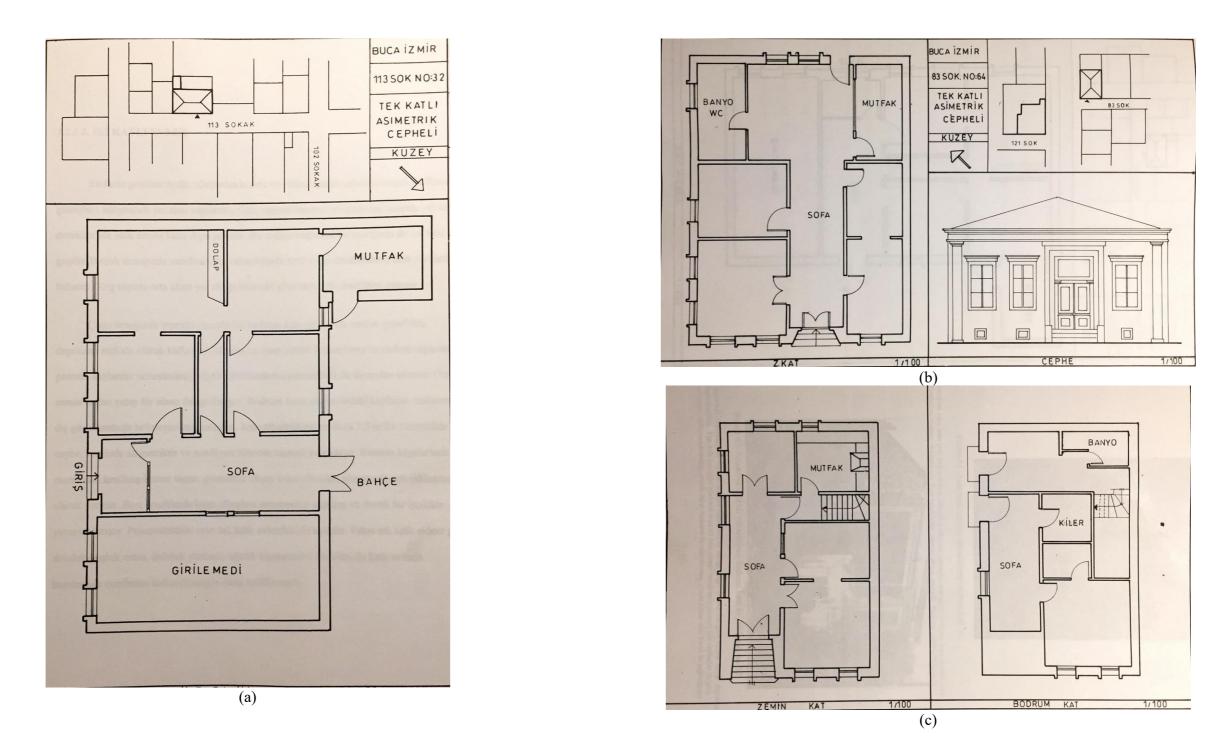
(a) Plan of İzmir House on 113 street in Buca, (b) Plan of İzmir House on 83 street in Buca, (c) Plan of İzmir House on Atadan avenue in Buca (Source:Bilginperk 1999)
